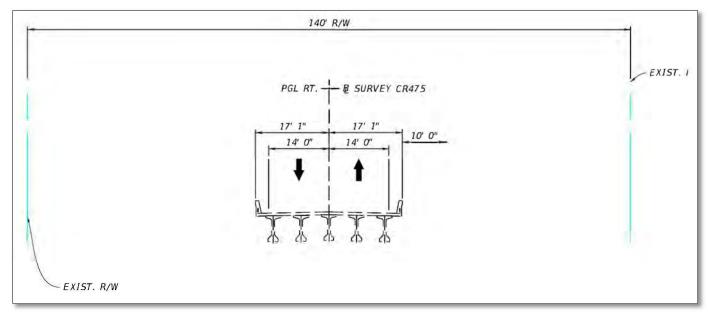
Existing Typical Section of C.R. 475 Bridge # 180048 (Over I-75)
